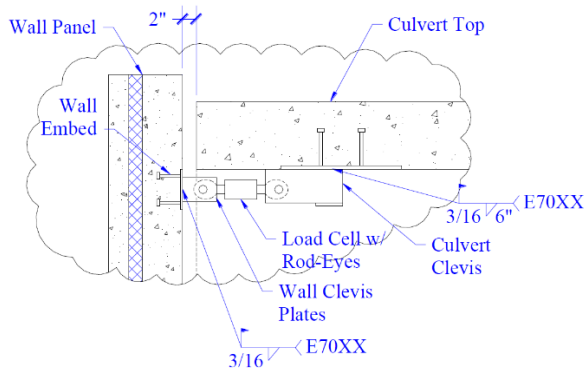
Single-Span Top Connection Detail (Naito et al. 2011)
